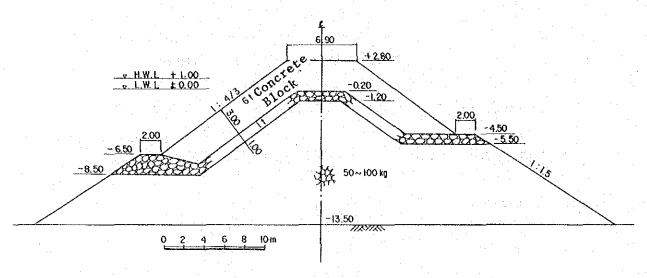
(1) Cross Section of Rubble Sloping Breakwater with Concrete Blocks
